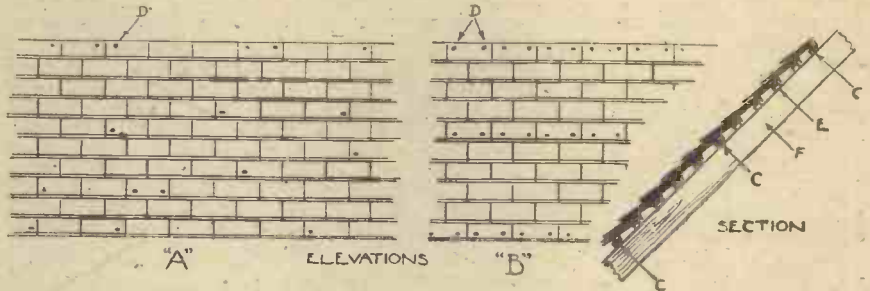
Roof tiling as it should be nailed and how it is jerryed to save nails and labour. "A"—Jerryed nailing. "B"—Correct nailing. C—Correct nailing to every fourth, fifth or sixth course of tiling. D—Nails. E—Tiling battens. F—Rafters.
